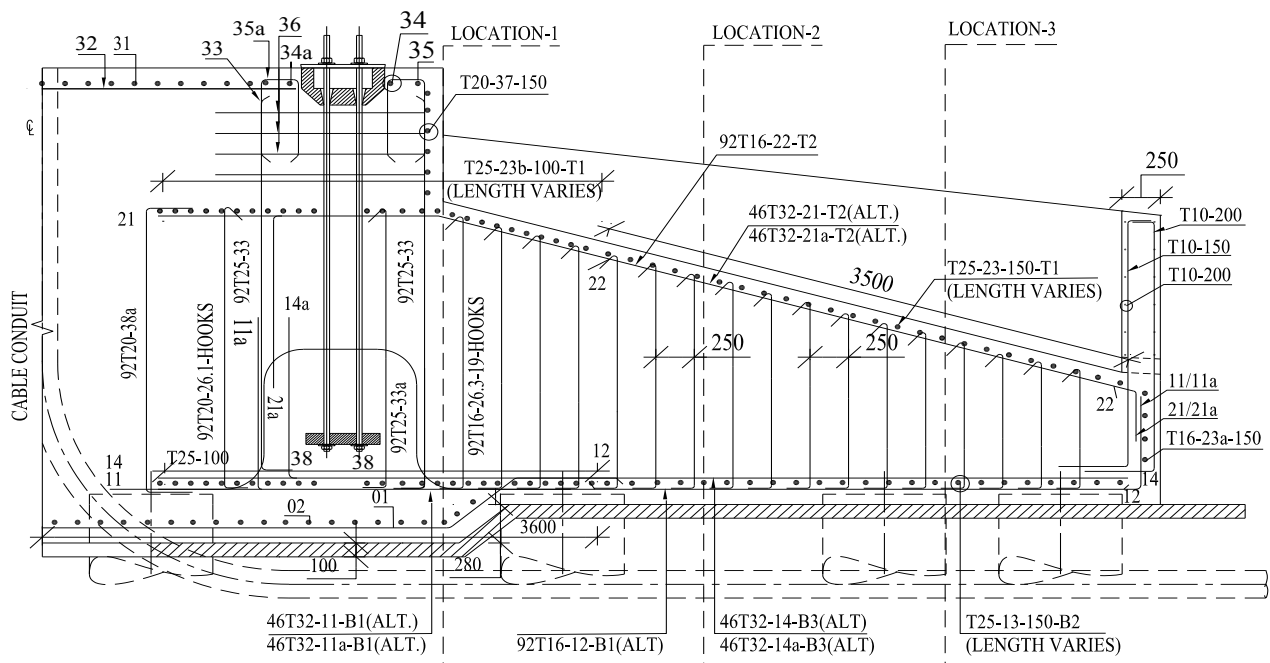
Portion of WTG Pile Cap reinforcement arrangement
